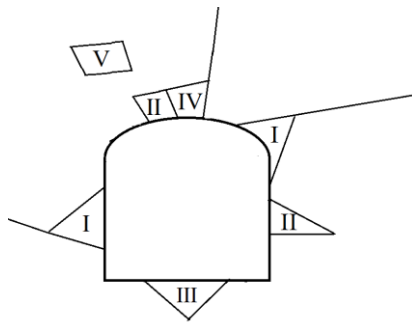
Types of blocks around an excavation section (sourced from [19])
